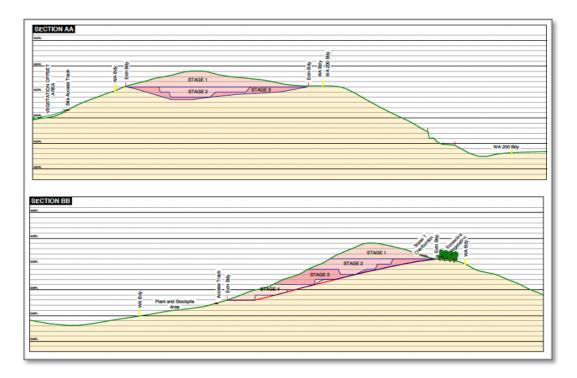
Excerpt of Site Layout Plan, shown sections AA and BB.
